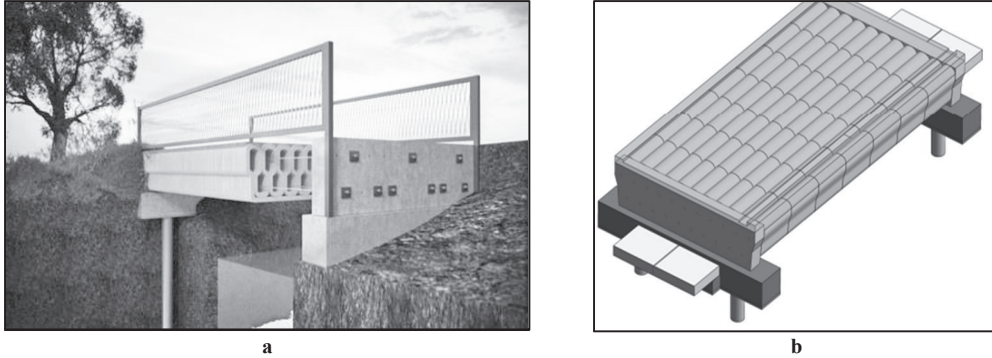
, b 3DCP bicycle bridge conceptual design. (illustration by BAM)
